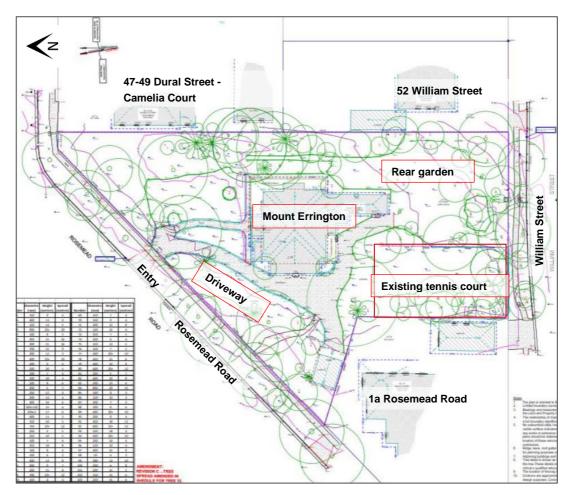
| Site plan and site components (Source: Applicant's EIS 2020)
